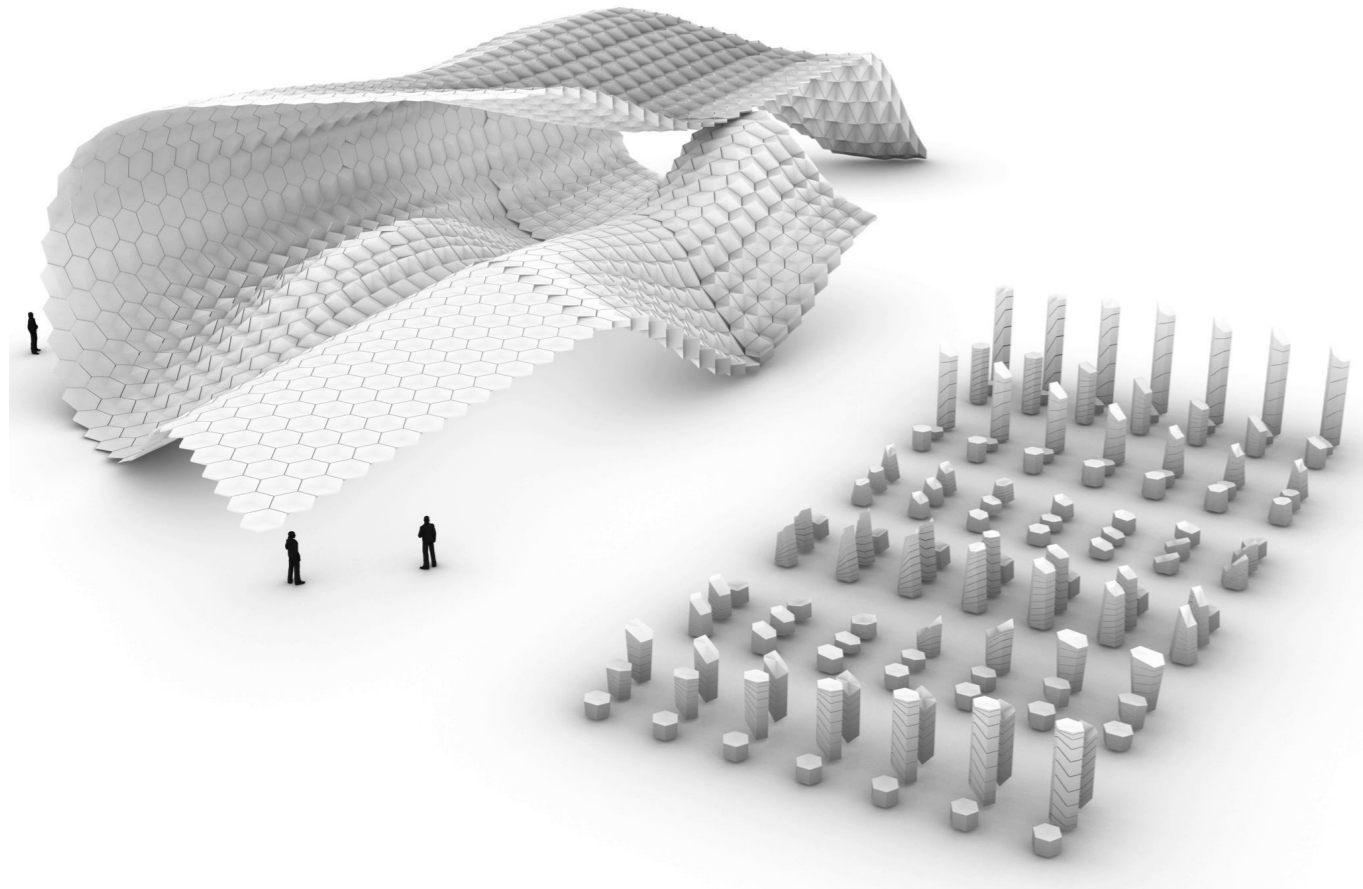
Pavilion towers and surface, Cast on Cast.
